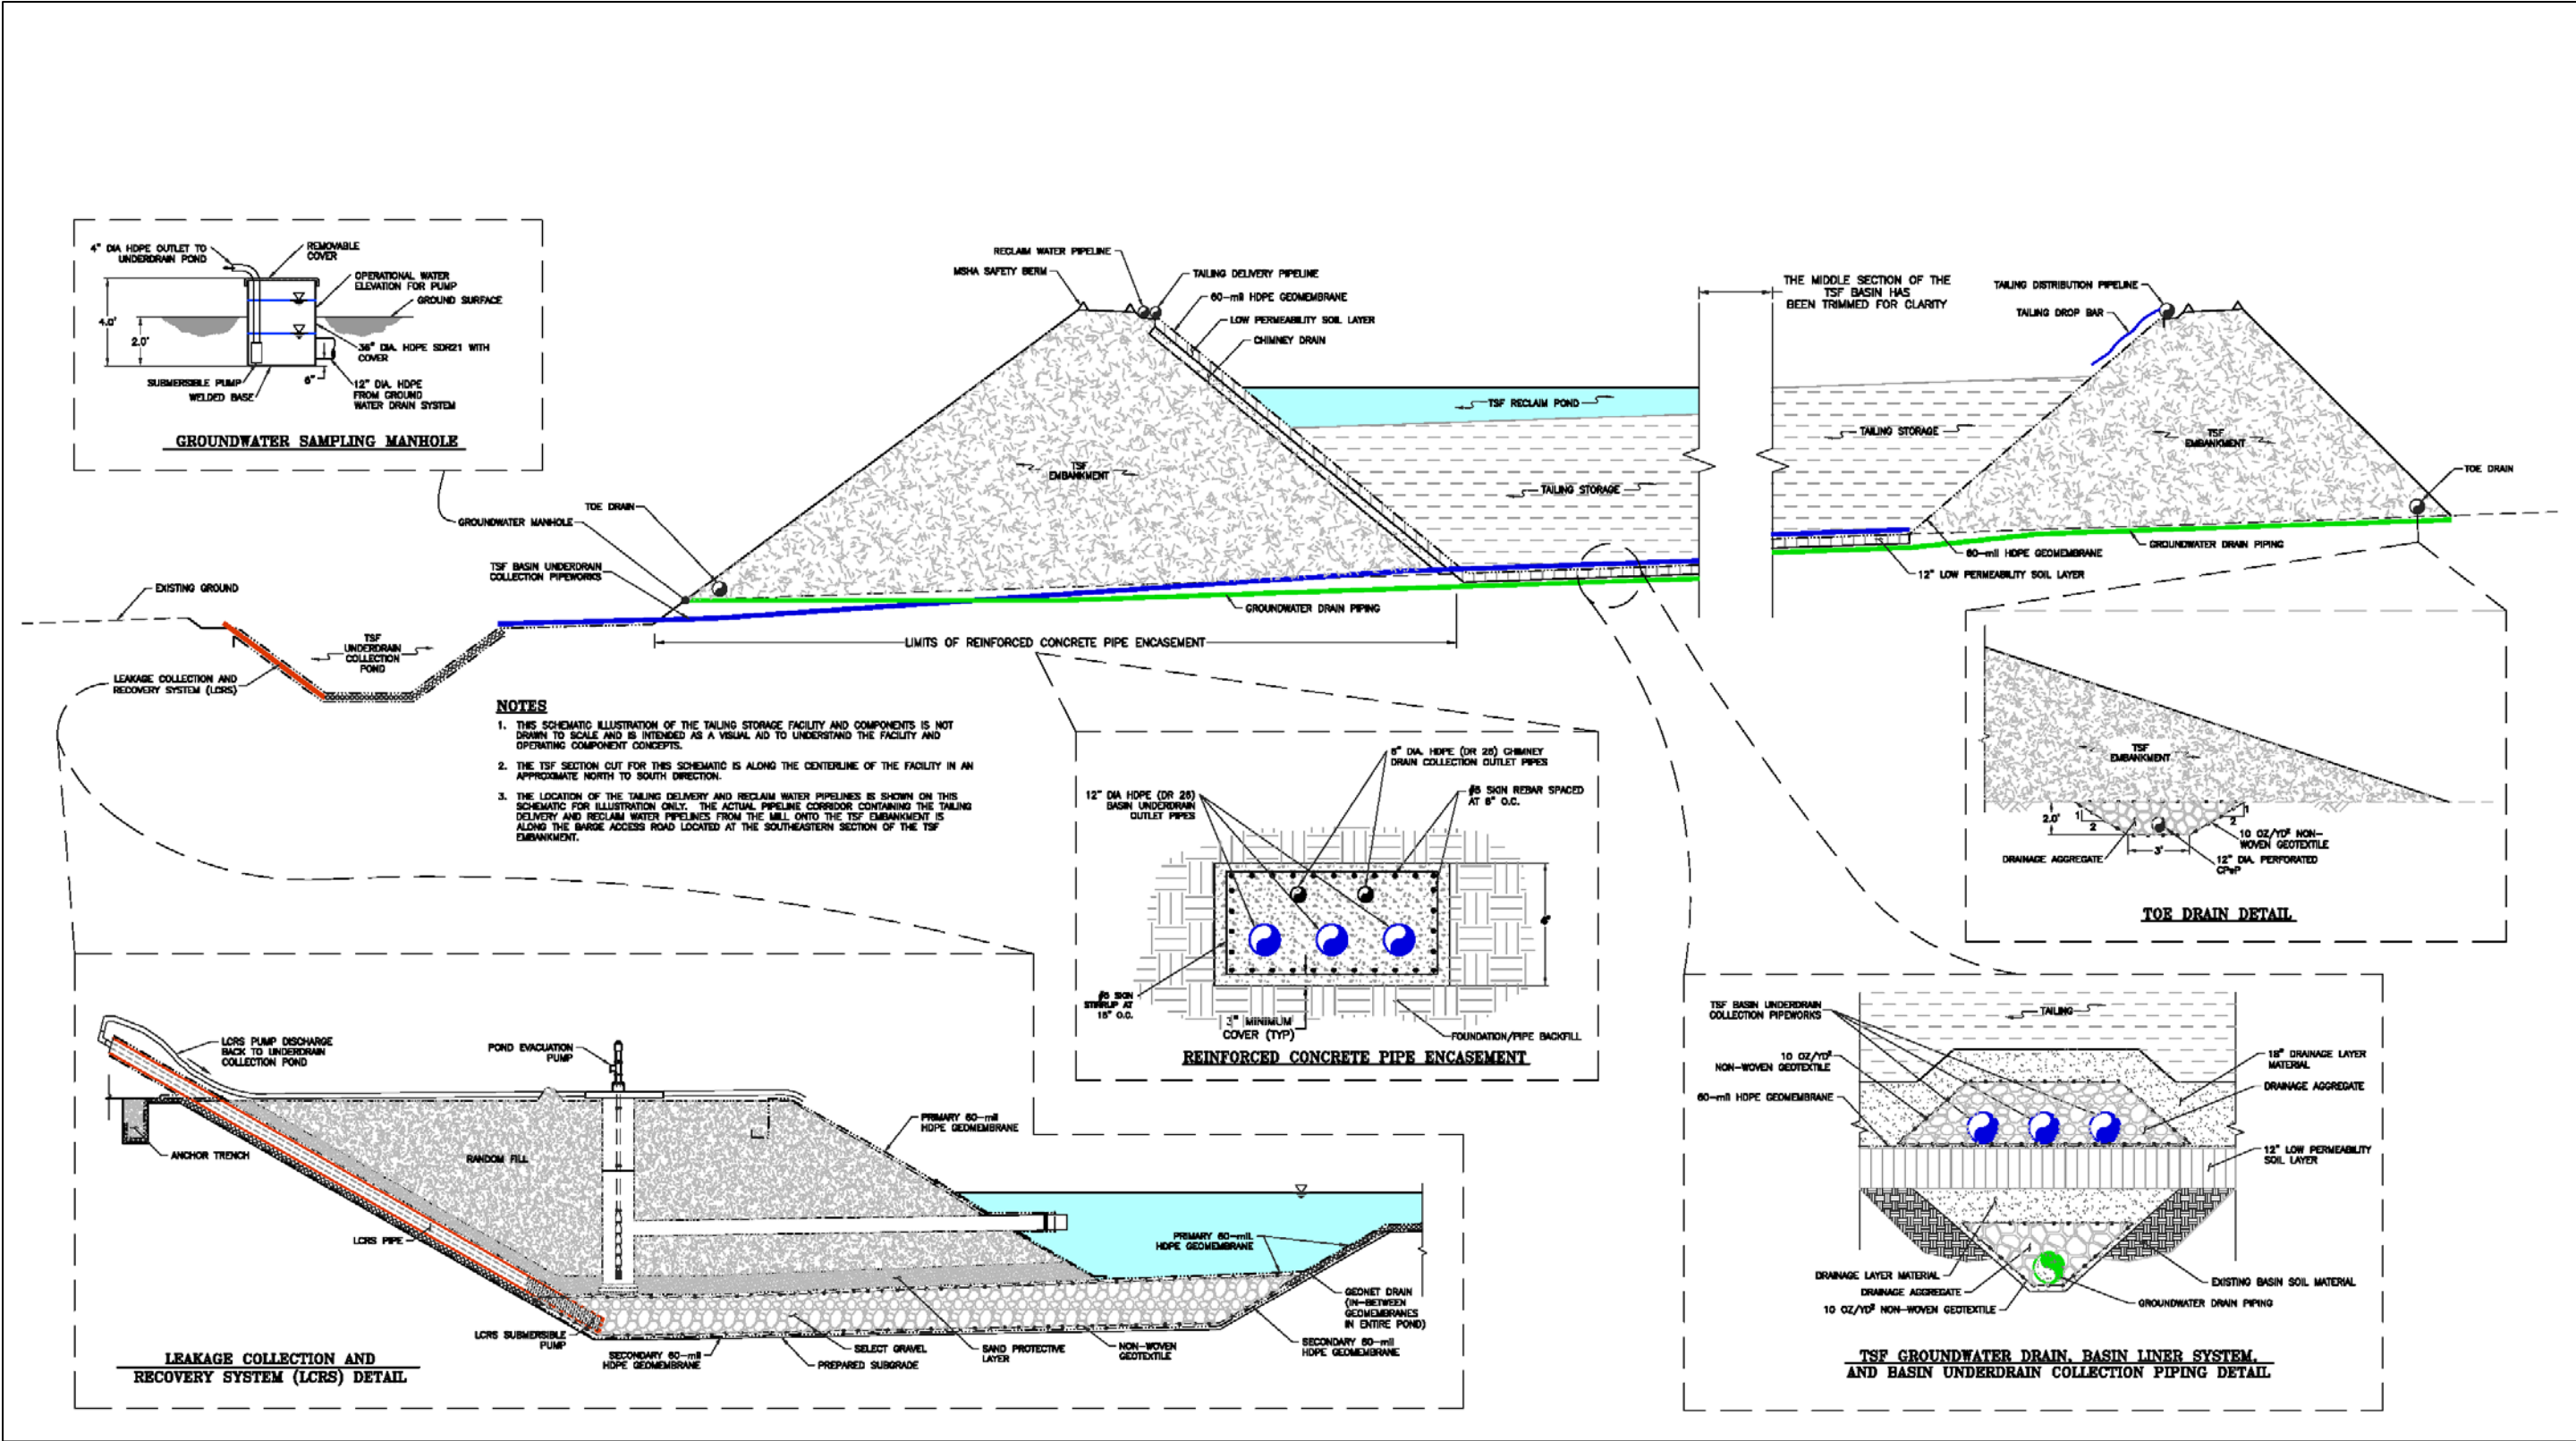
Cross Section of TSF Groundwater Drain and Seepage Collection System
